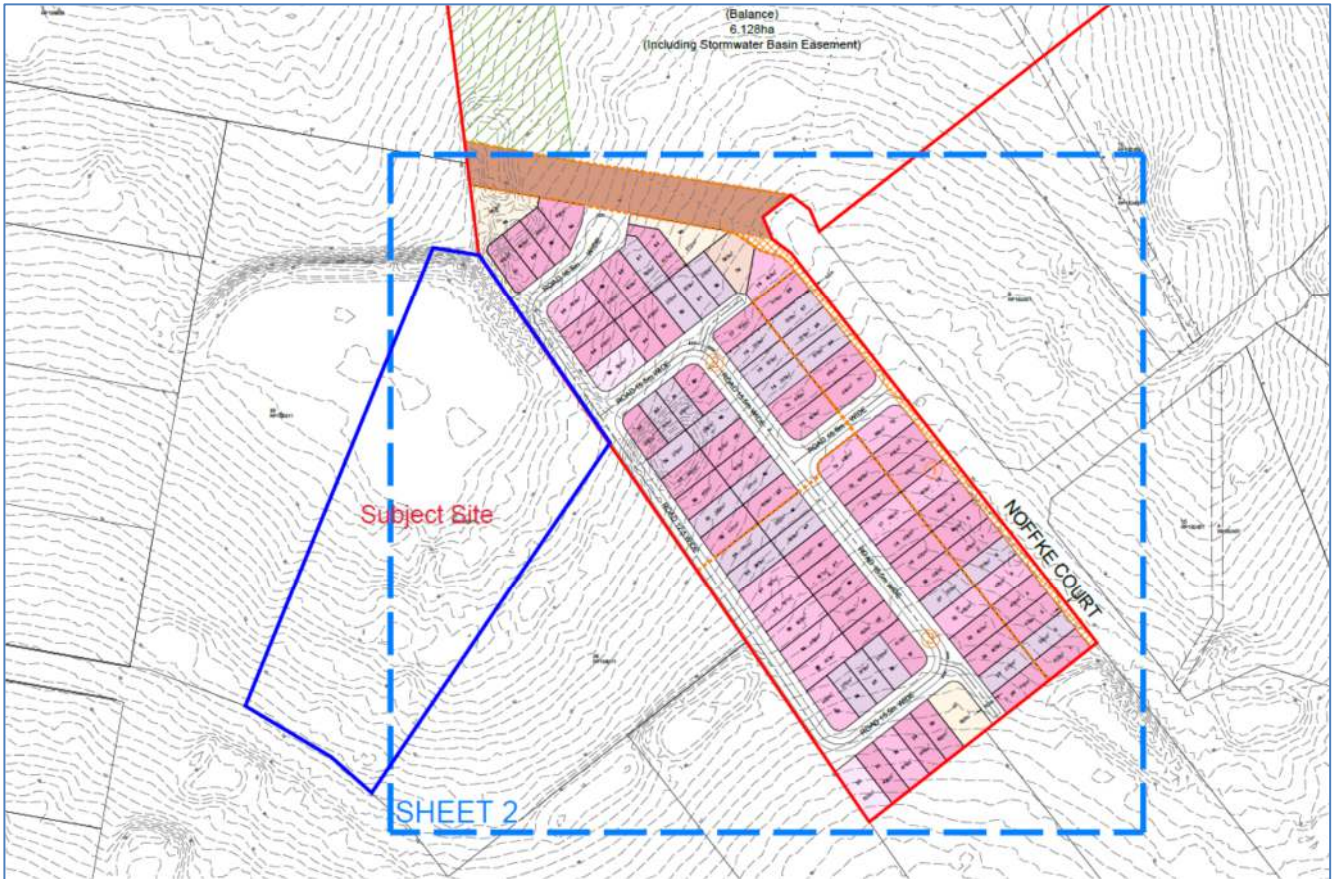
Proposed Subdivision Layout (COM-66-2017-A)
